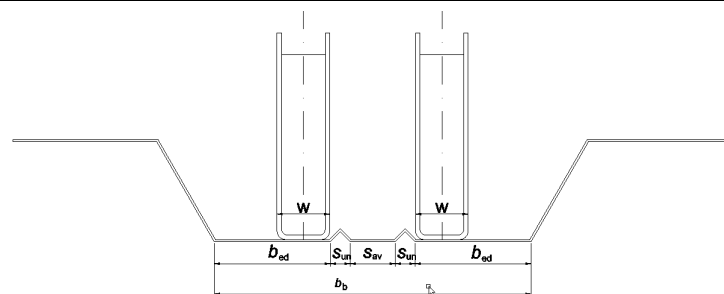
Sheeting with two rib stiffeners and connectors parallel with the beam (multiple rows).
